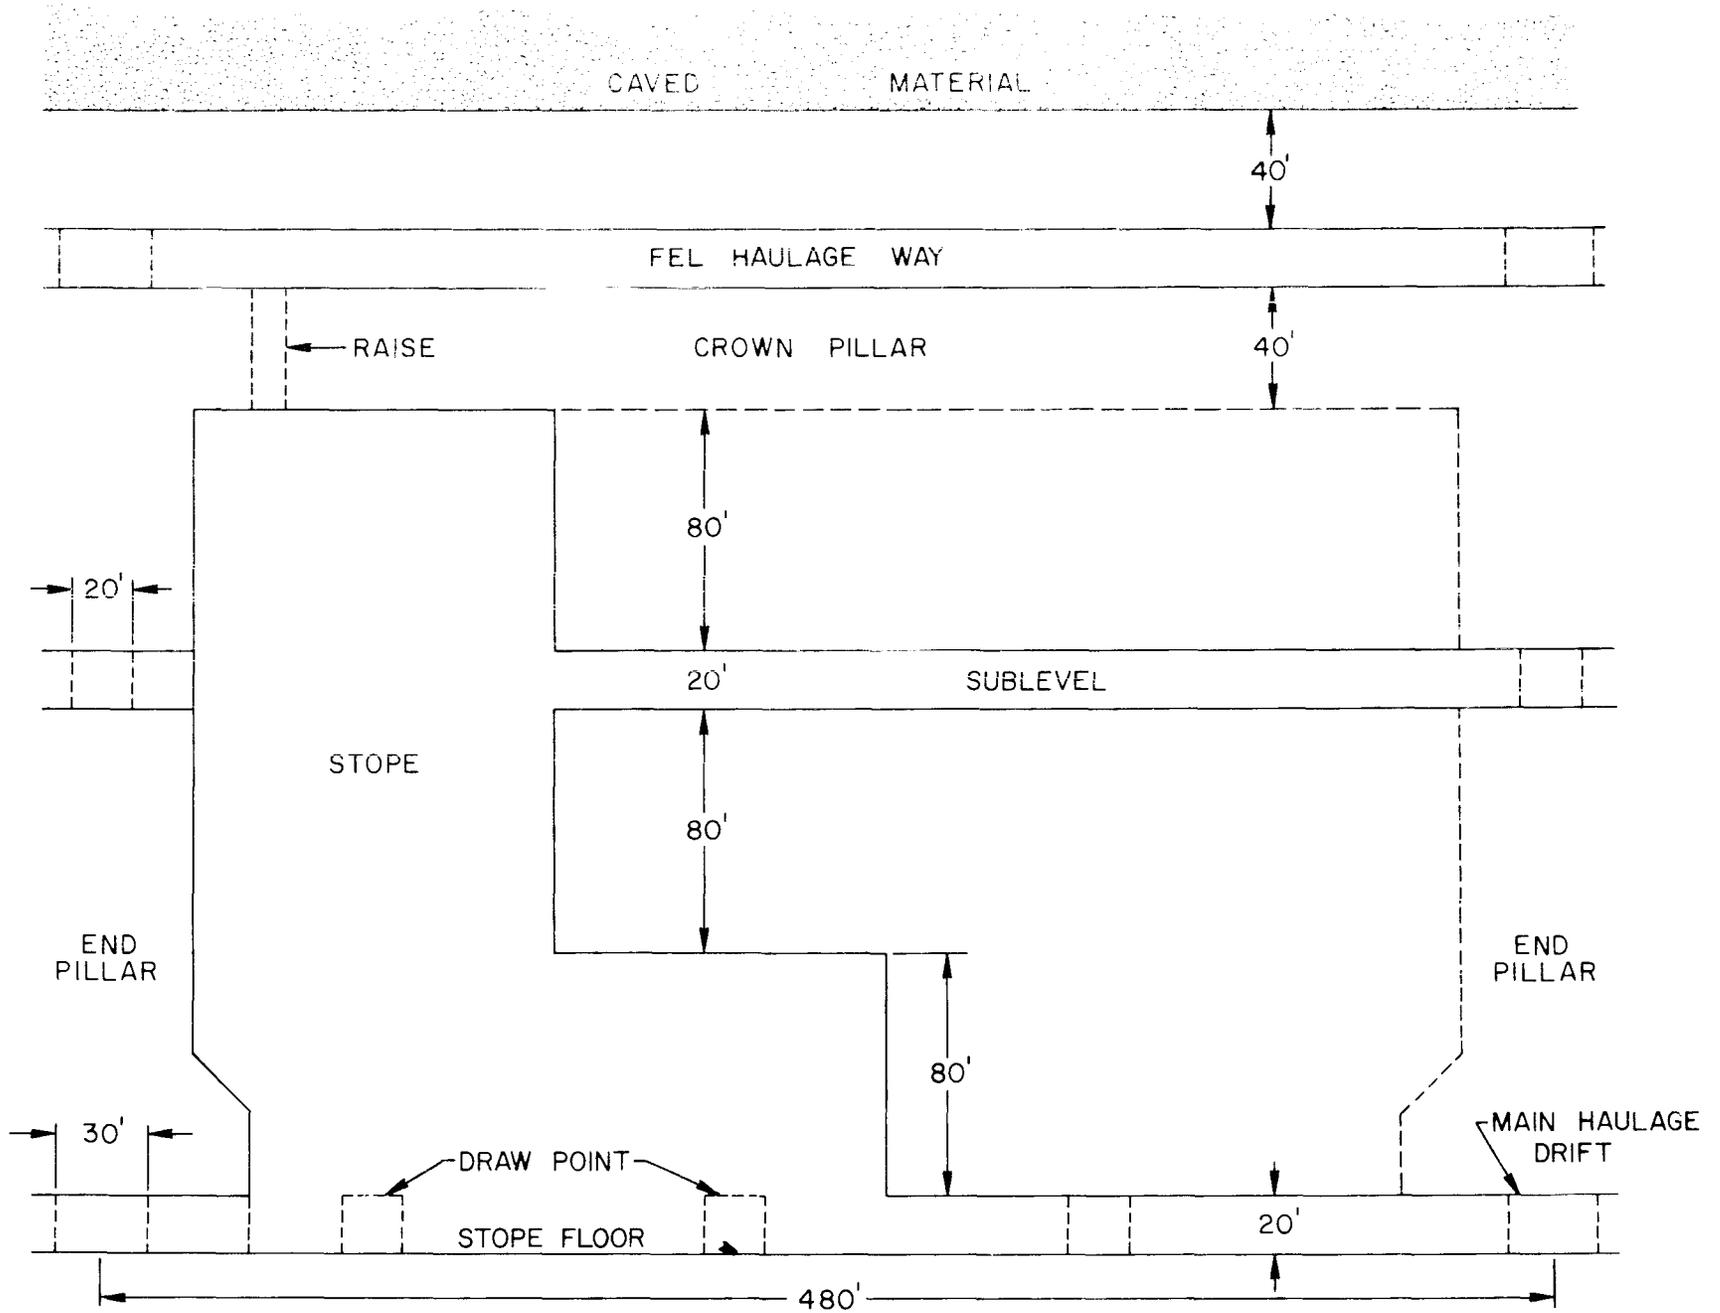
Longitudinal Section Through A-A', Sublevel Stoping with Full Subsidence
